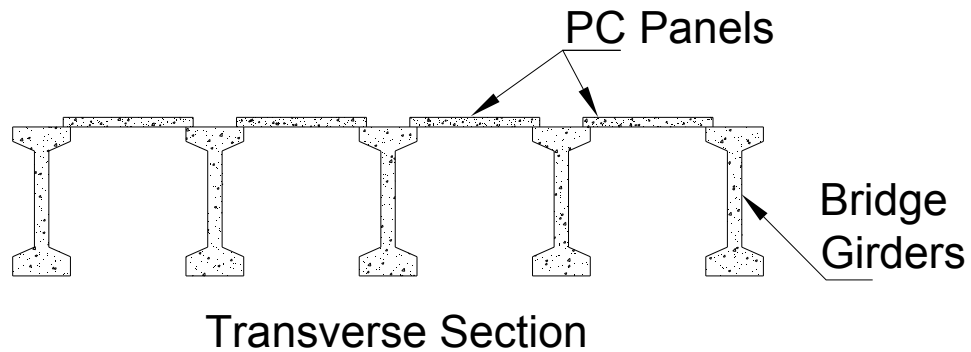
Typical Placement of PC Panels on Edge of PC Girders
